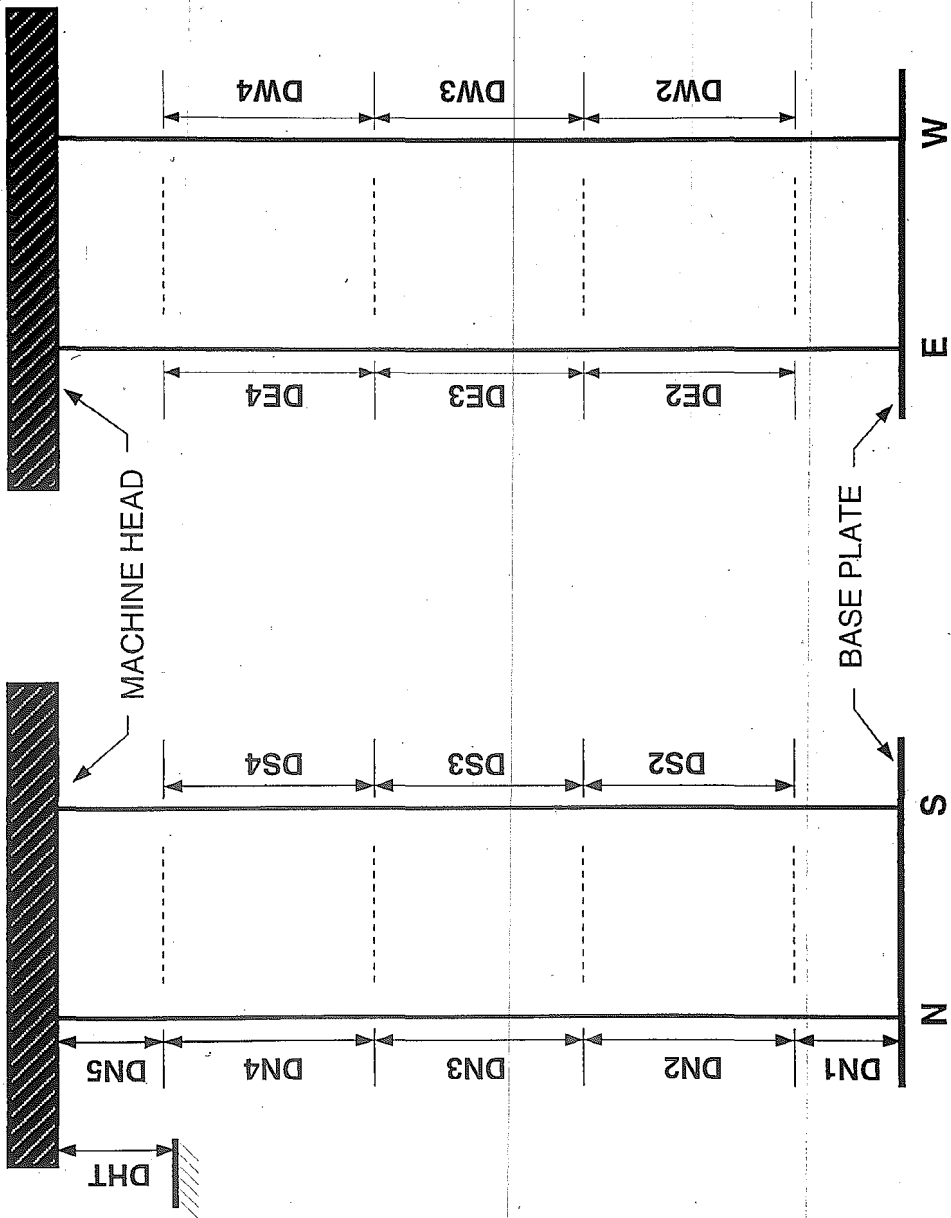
Instrumentation Plan A - Layout of displacement transducers.
